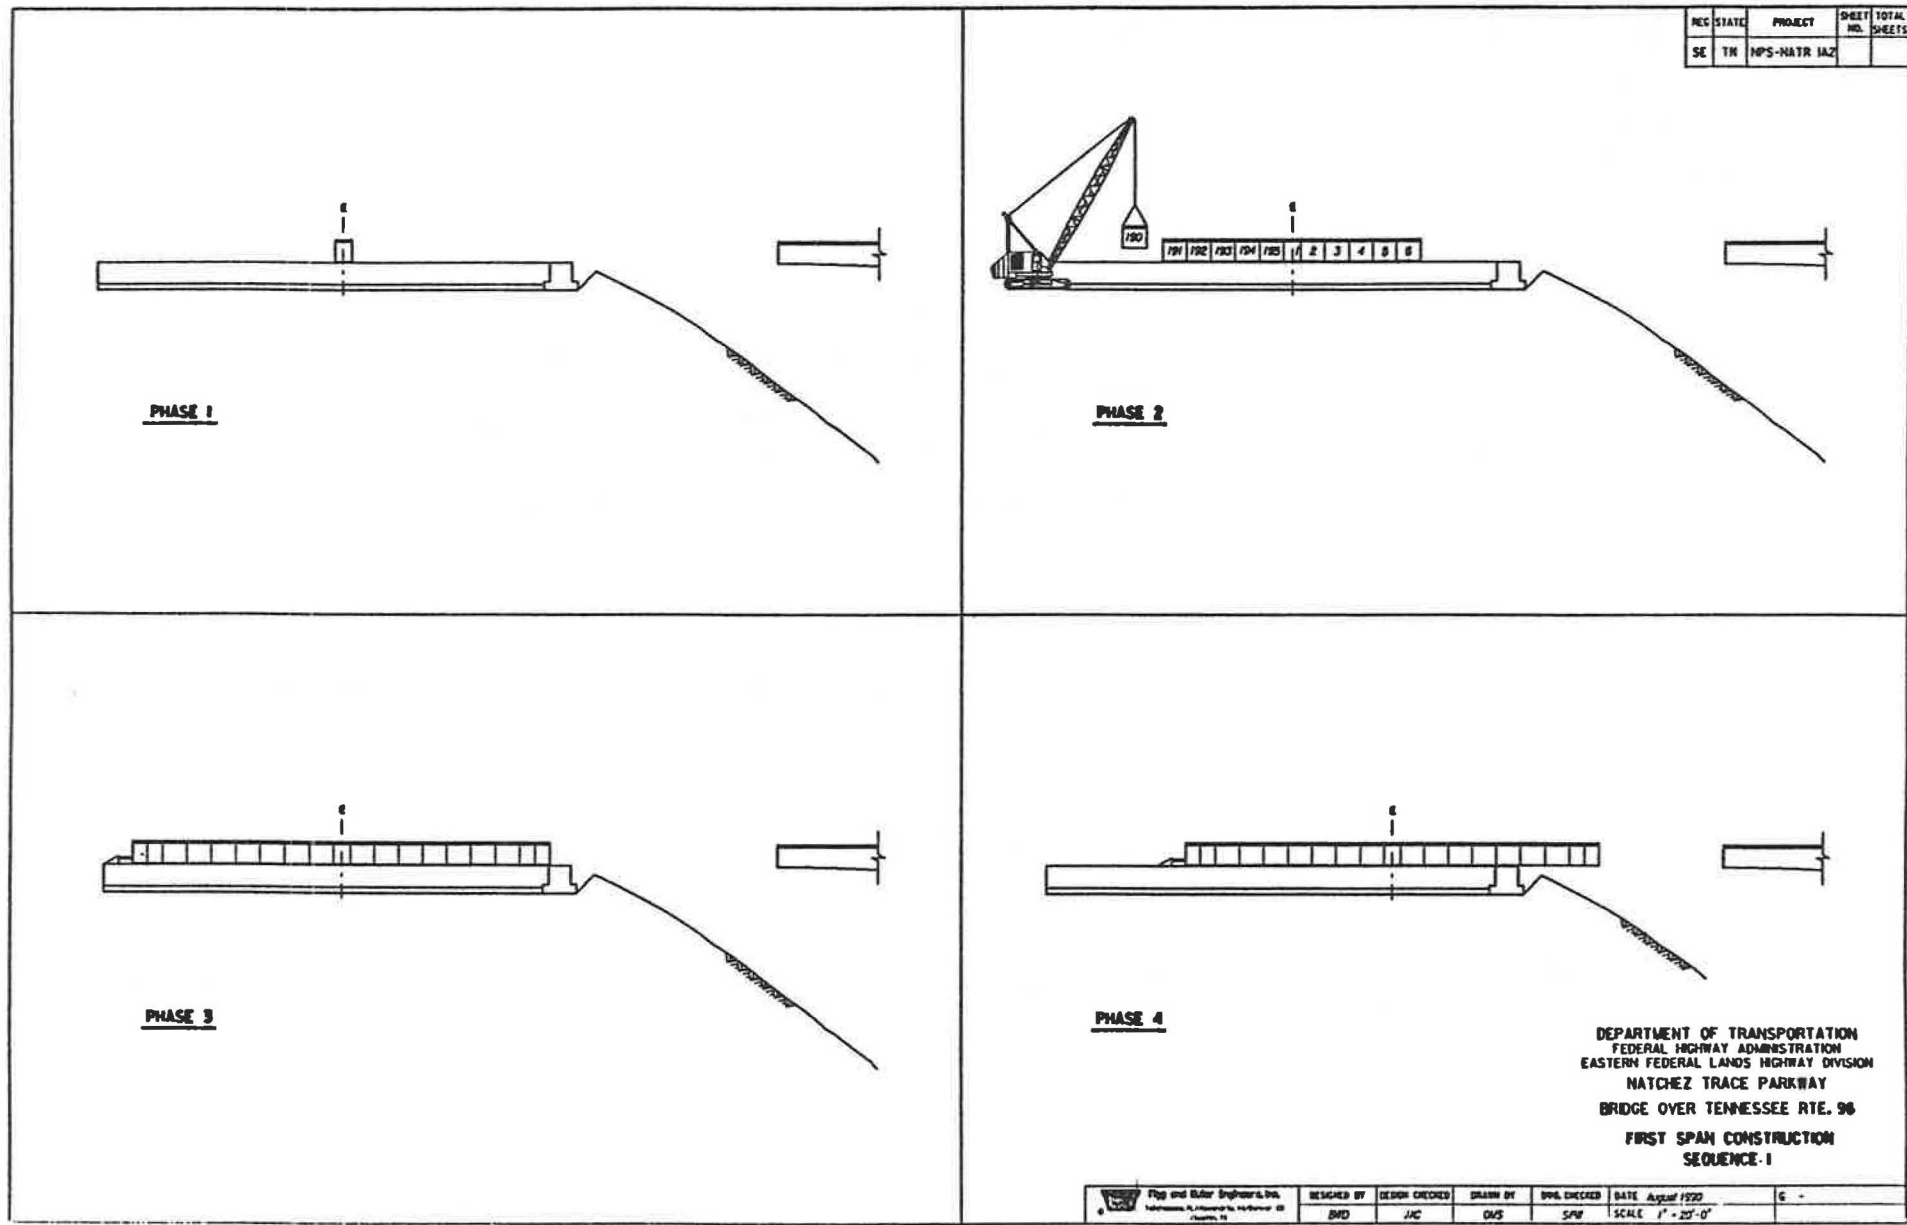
First span construction - precast alternate - phases 1 through 4
